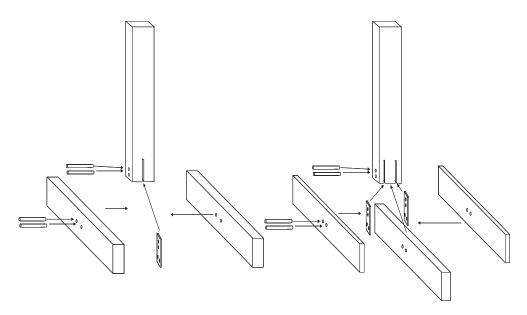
Specimen composed using boards and drift pins (Left: single-board type, Right: double-board type).
